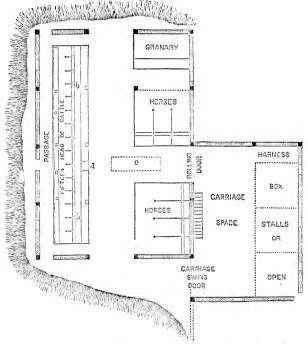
Principal Floor—Main portion, 40 by 60 feet; Wing, 30 by 40 feet; Cow Stable, 13 feet wide—Stalls, 3\(\frac{1}{2}\) feet wide; Horse Stable, 14 feet wide—Stalls, 4\(\frac{1}{2}\) feet; a a, Manure Gutter; b b, Stanchions; c, Position of Threshing Machine; d, Movable Boards to admit Band from outside.
